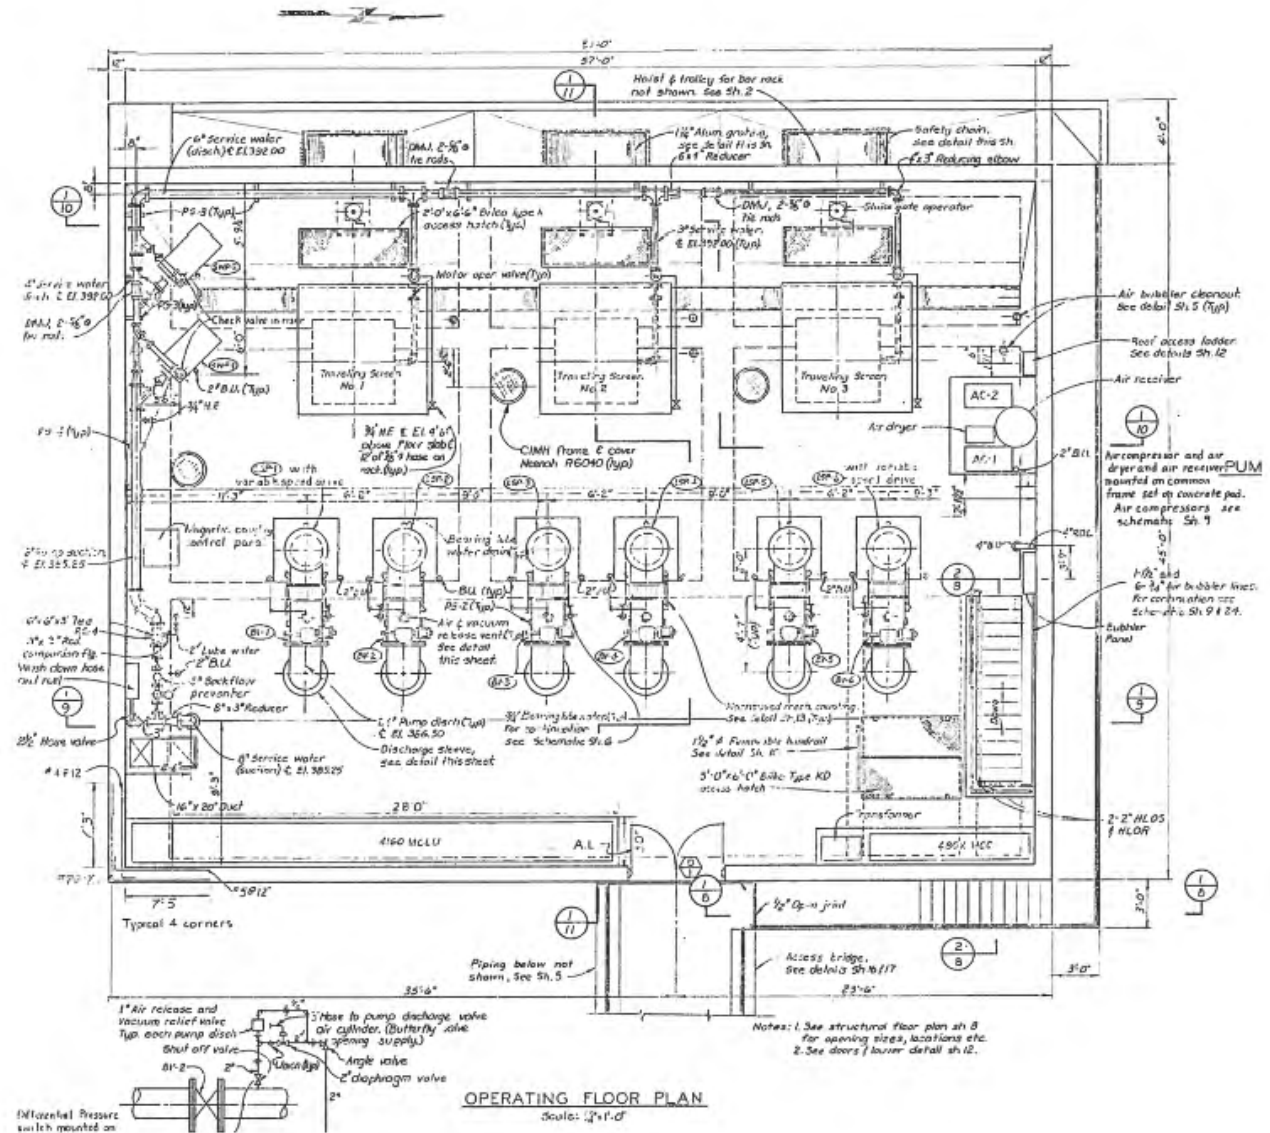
Intake Pump Station Operating Floor Plan (existing)
